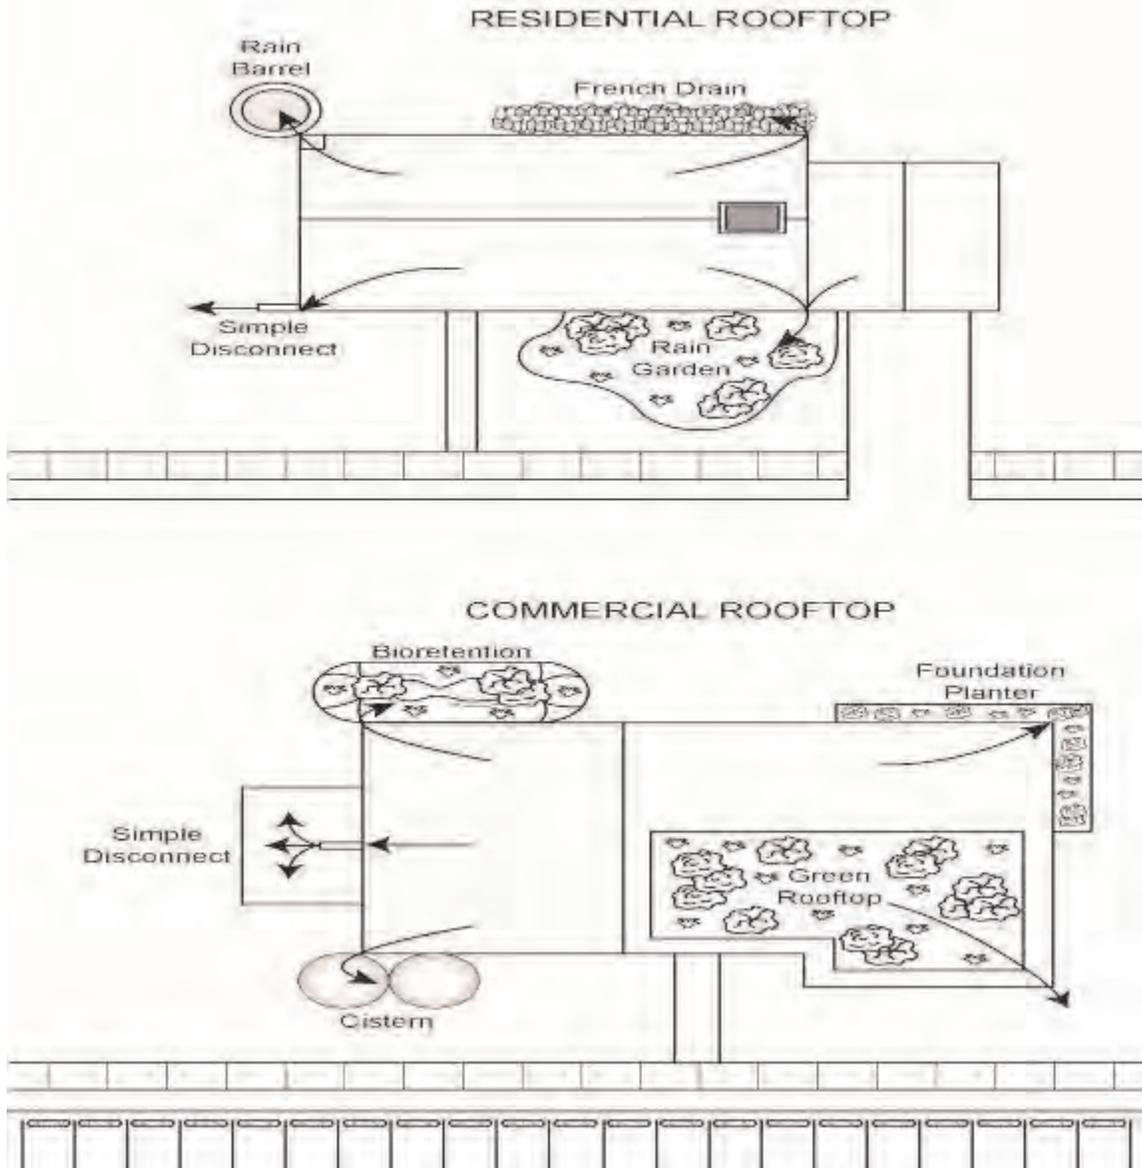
Roof Disconnection and Alternative BMPs.
